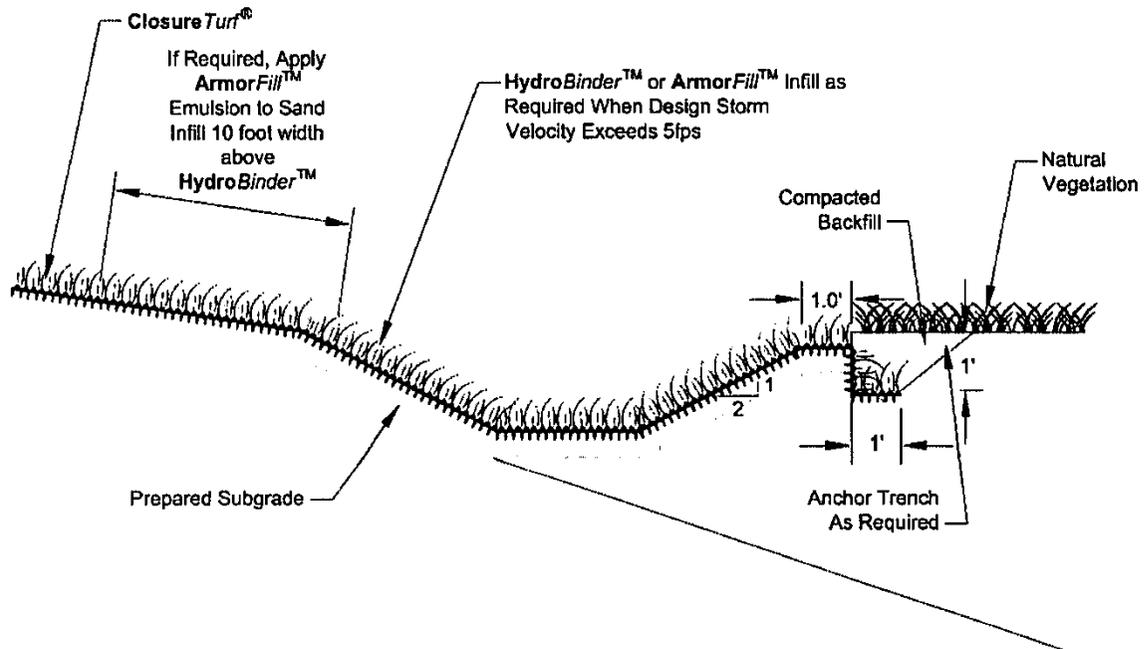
Typical ClosureTurf® with HydroBinder® Infilled Ditch Section
